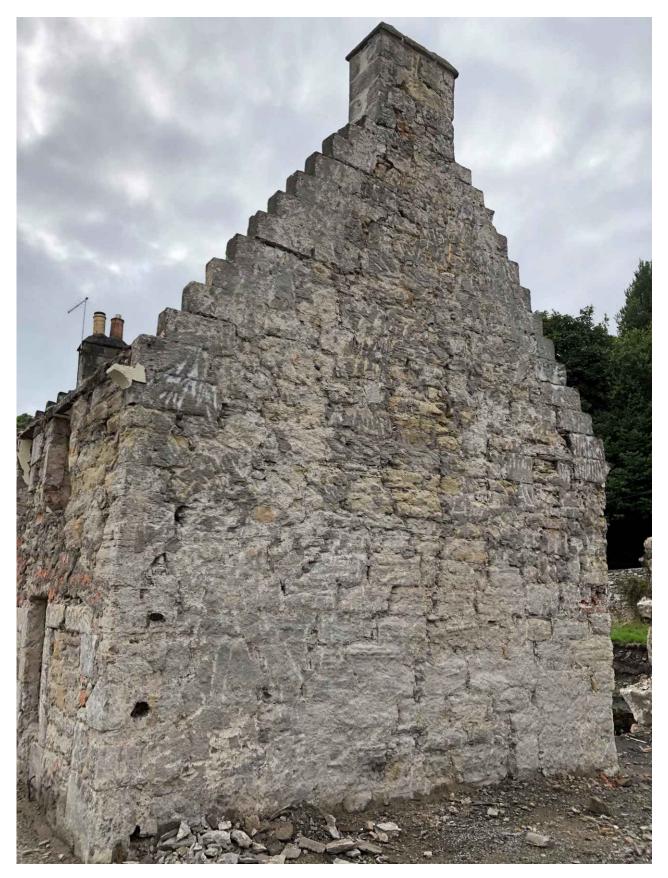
East gable showing original wall construction and skew puts at the same height indicating a typical symmetrical roof and building form. This gable also shows the impact of high moisture content within the walls.
